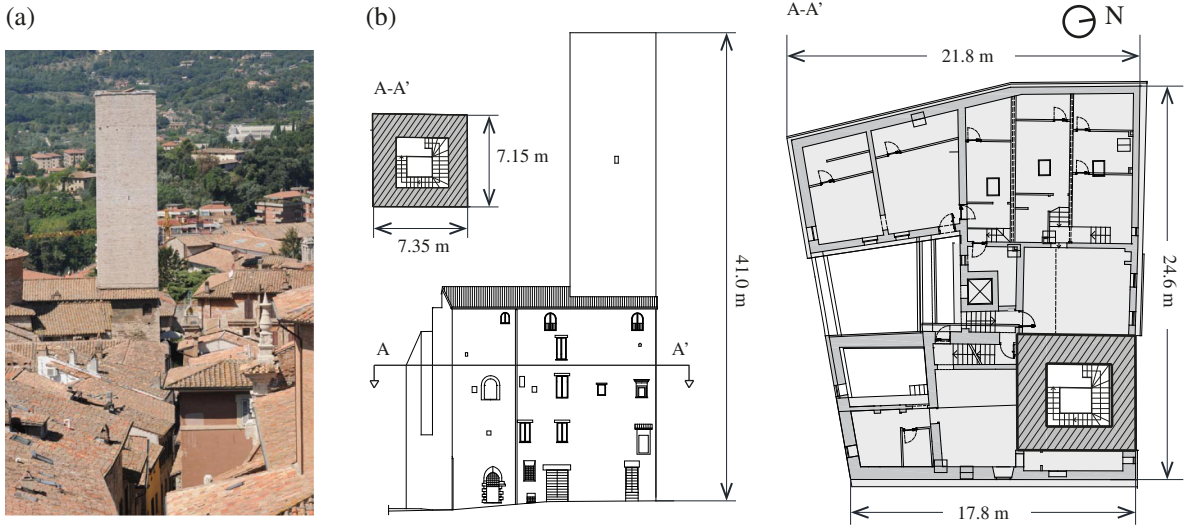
A photograph of the Sciri Tower (a), and elevation and plan views (b).
